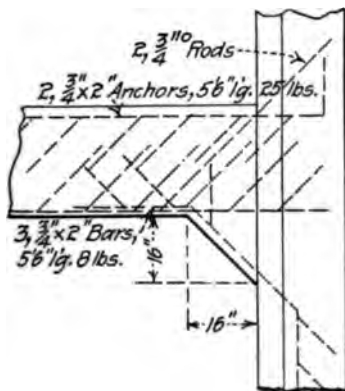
Knee Brace, Twelve-Story Loft Building.
